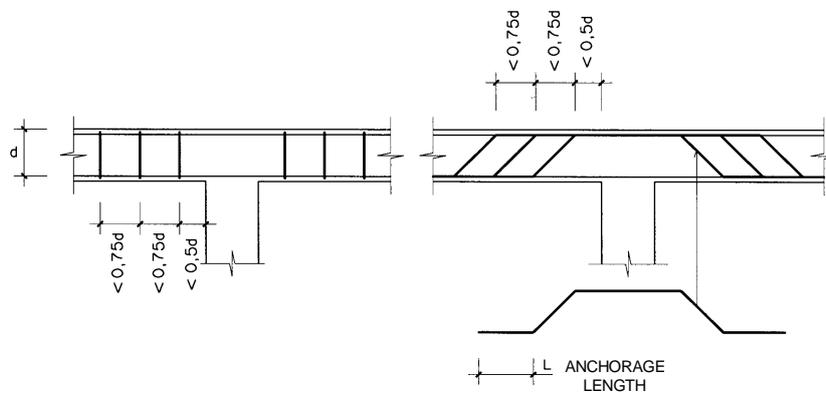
b. Elevation of the types of punching shear reinforcement
